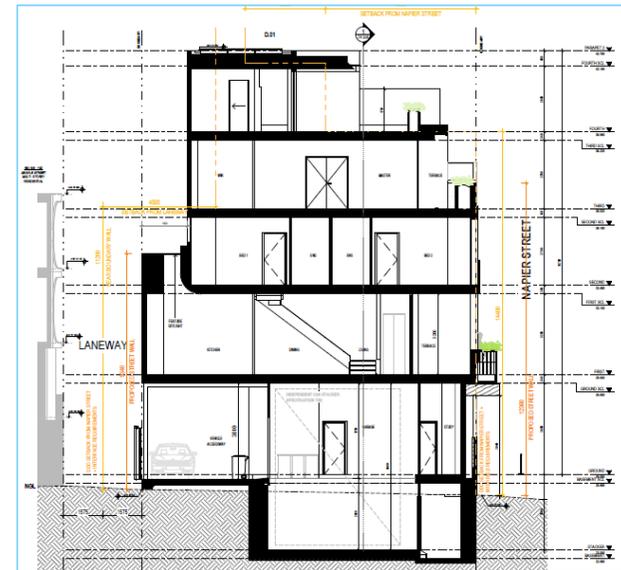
Napier Street – street wall height and upper-level setback & rear interface - street wall height and building separation
